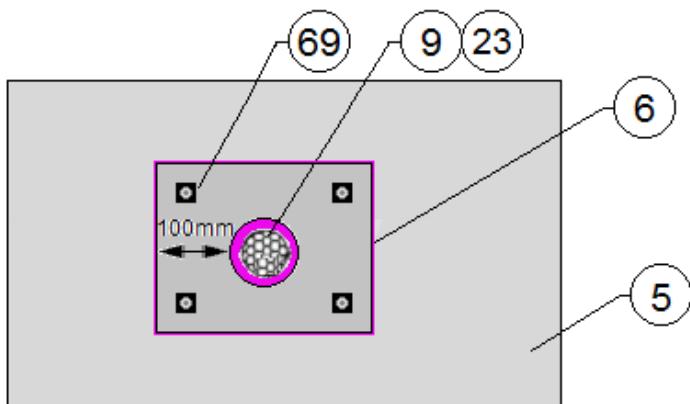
Section View of D1 and D2 Cables with/without Cable Trays in TBA Firefly™ Intubatt not against Wall Construction in Horizontal Substrates – Wrapping on Bottom Side
